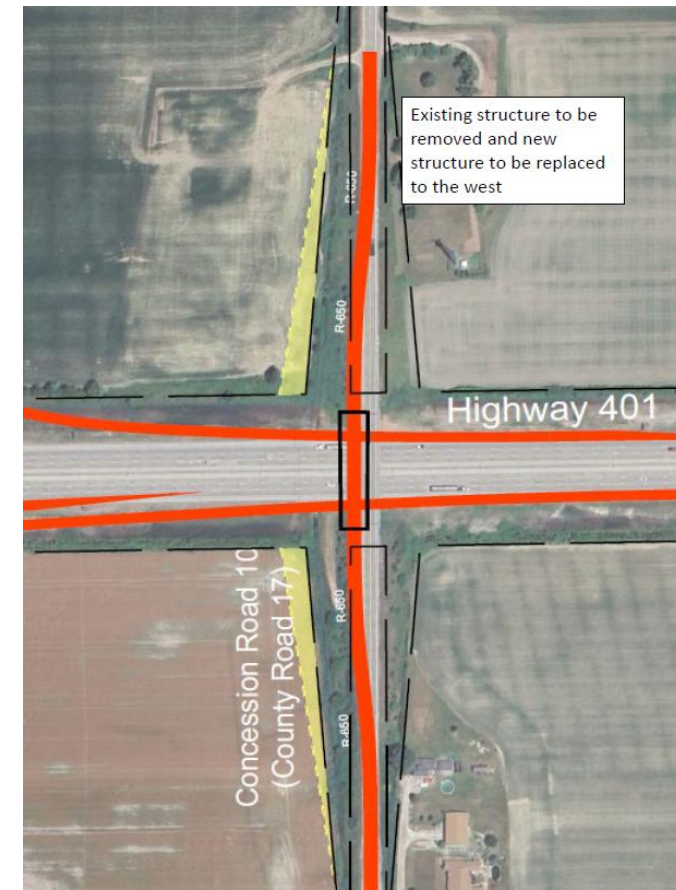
Alternative 3 – West Bridge. Open with two lanes
